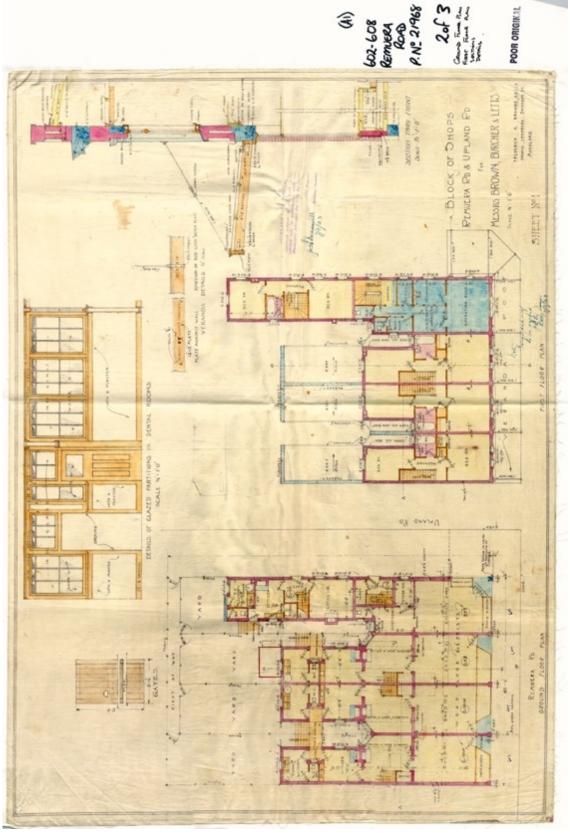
Plan and detailed drawings of four shops and dwellings undertaken by architect, Frederick A. Browne for Messrs Brown, Burcher and Letts, dated 1923 (AKC 305 Building Permits 1900-1998, 602-608 Remuera Road, Record ID: 391062, Auckland Council Archives).
